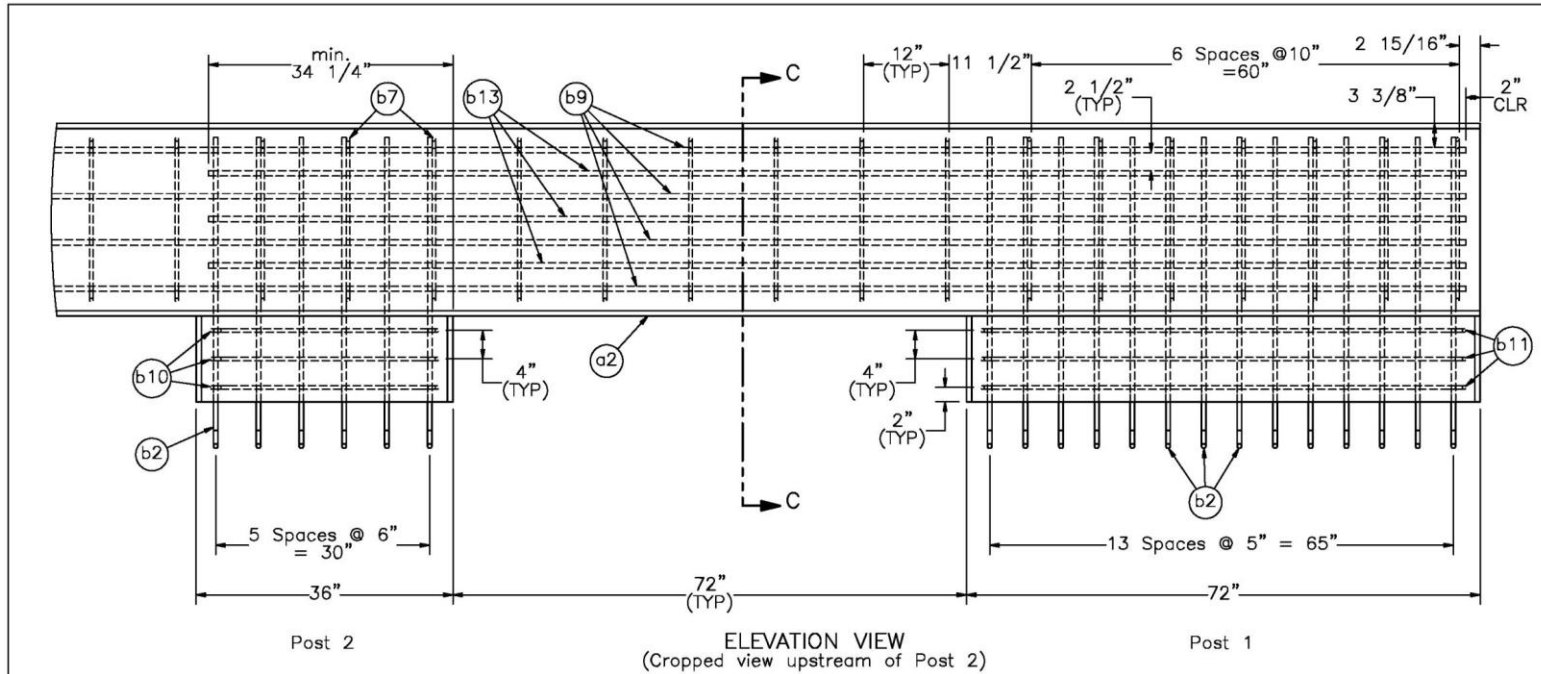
Concrete Rail, Deck, and Box Beam Assembly, Interior Section, Test Nos. OCBR-1, OCBR-2, and OCBR-3
